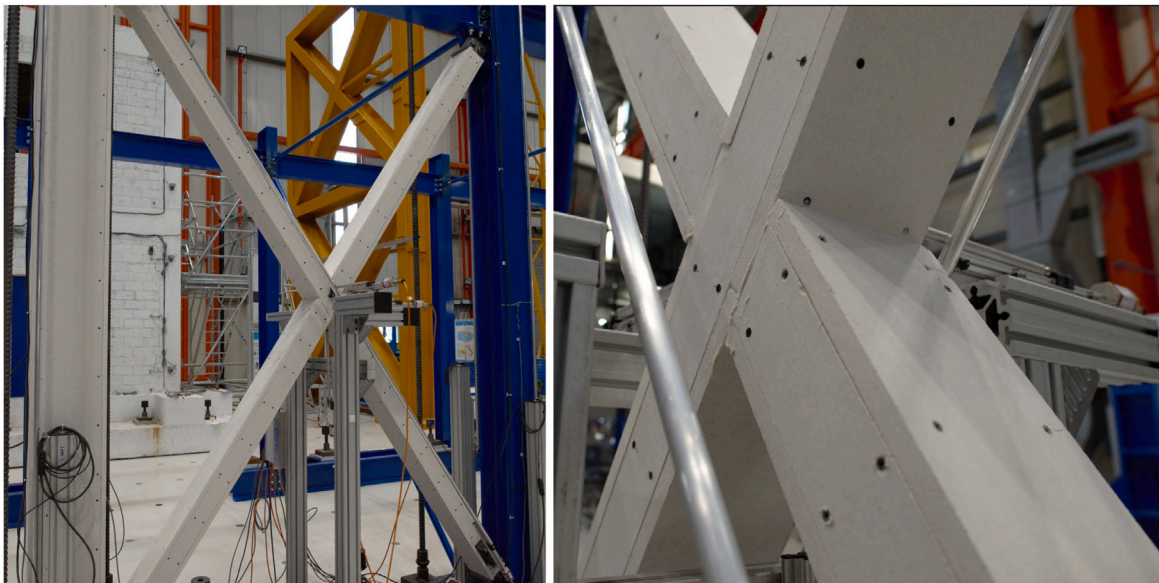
Damage state of Frame C after test B-EQ2: (a) bracing system; (b) enlargement of the brace crossing.
